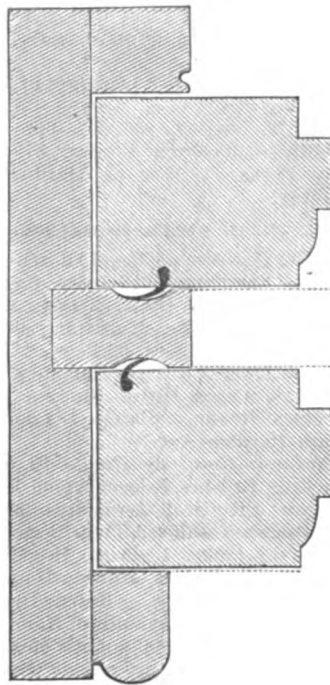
Horizontal Section Through Window Frame, Showing Application of Everett's Weather Proofing.
